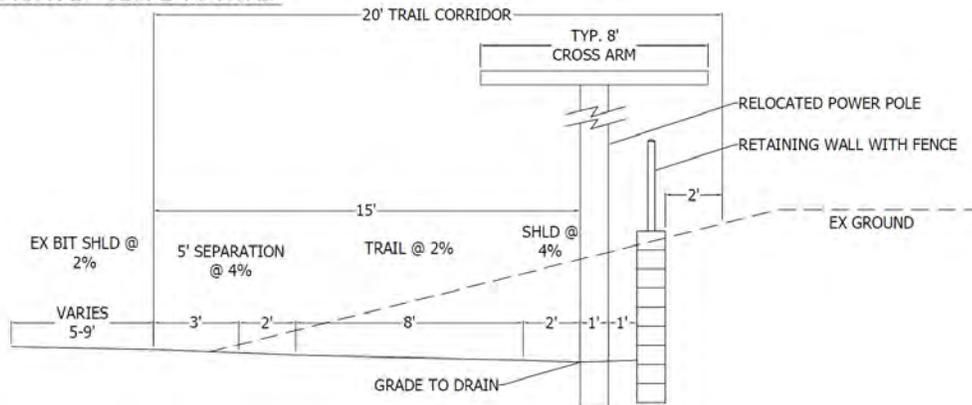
Surface Drainage and Ditch with Retaining Wall Above
